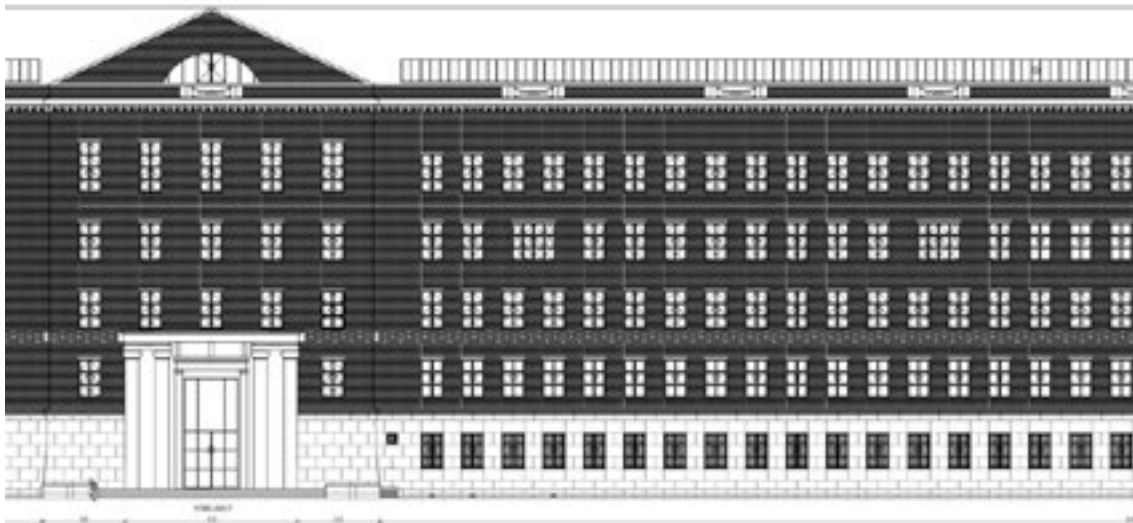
Façade of Building R, Budapest University of Technology and Economics (detail). Plan: Plan Archive of Budapest Technology and Economics.
